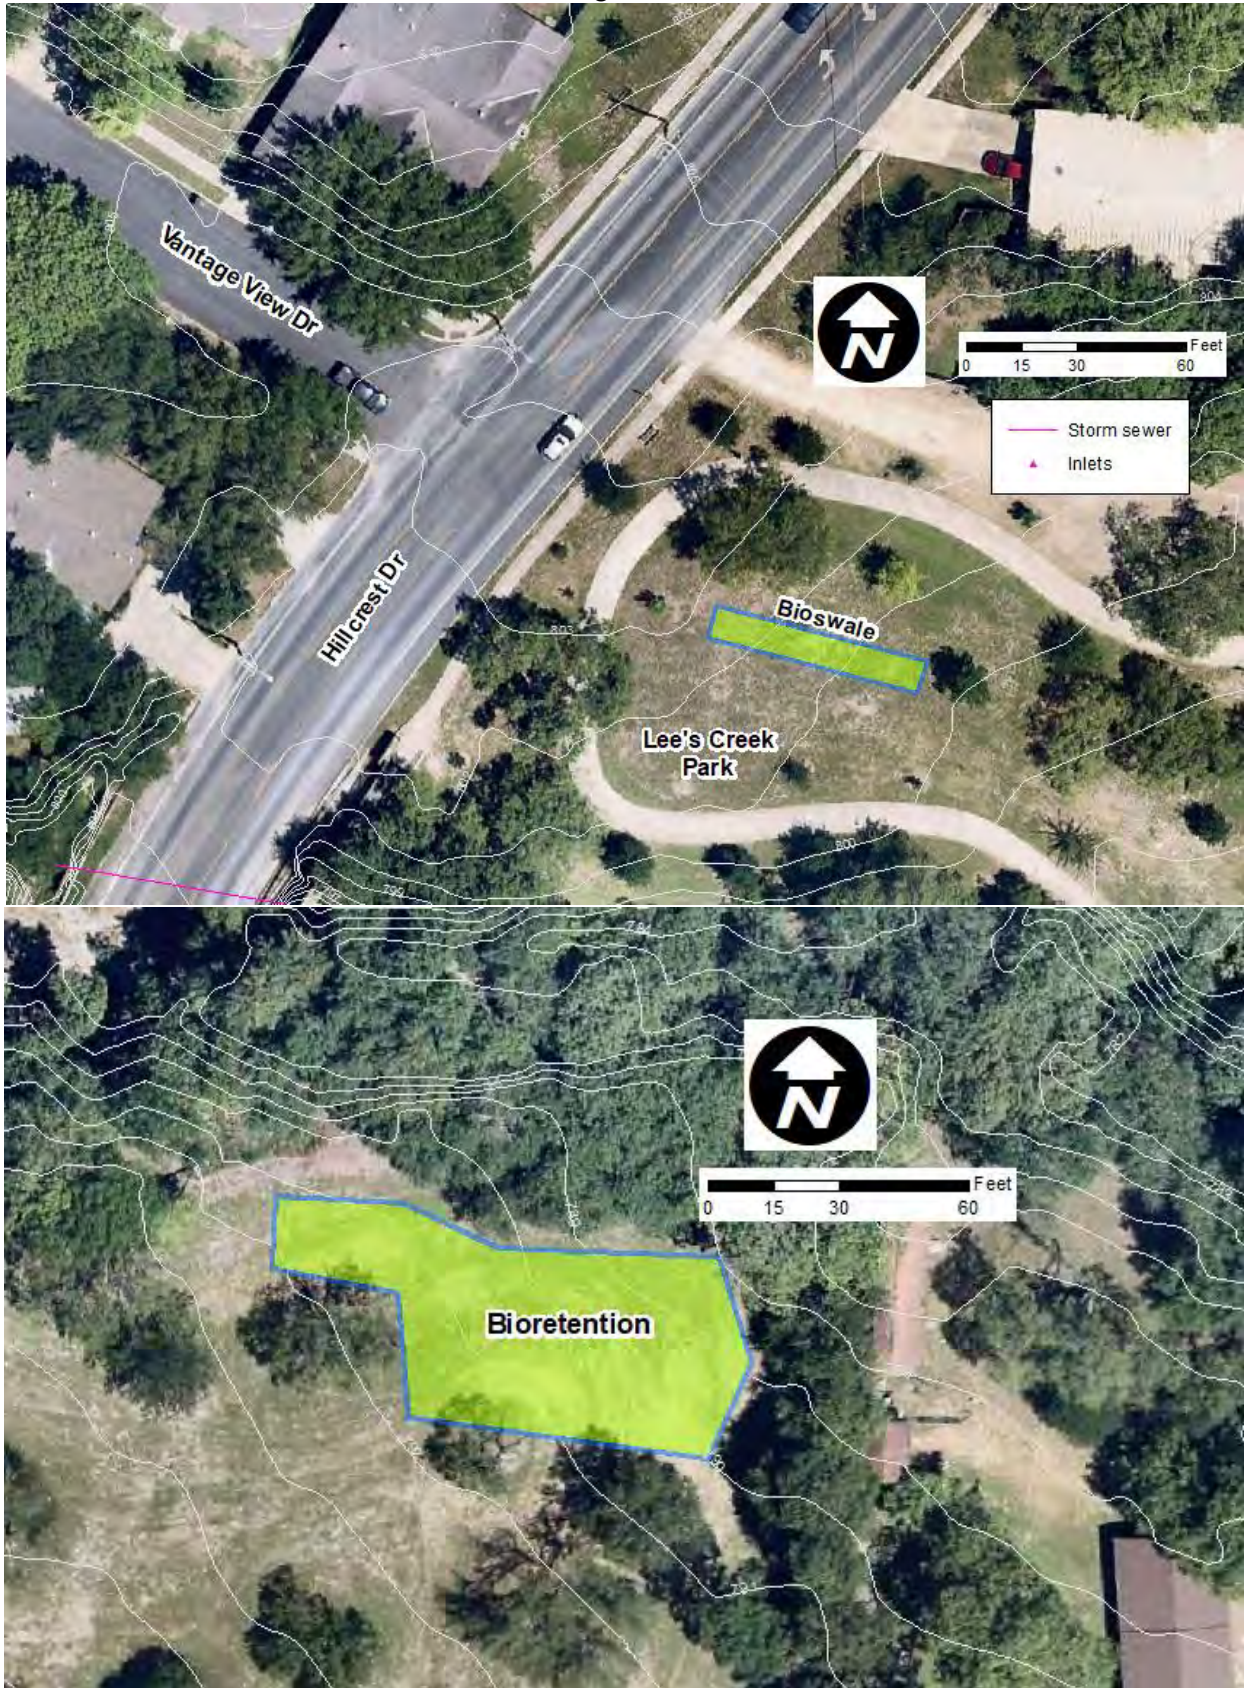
Proposed BMP Layout on Subbasin 310 Site
